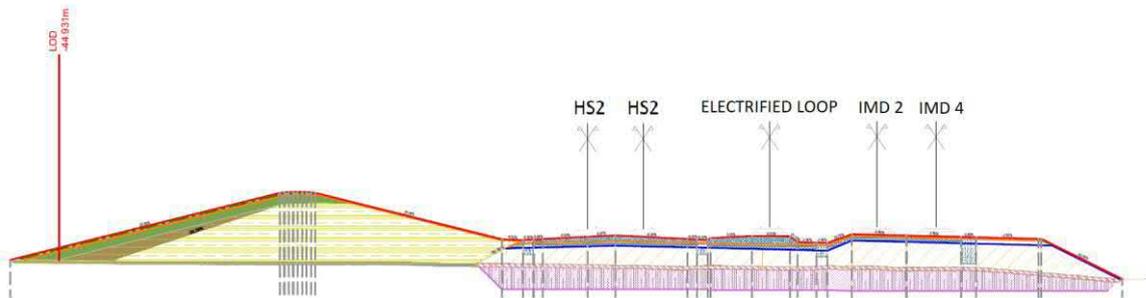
Cross Section of Twyford Embankment at Ch.HS2 80+940
